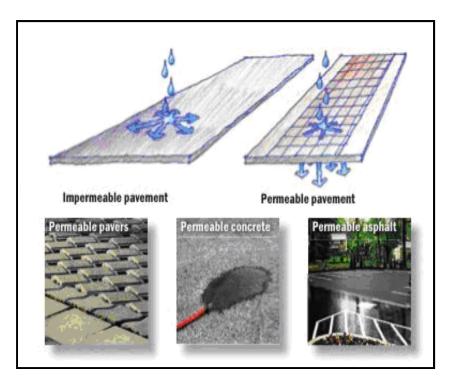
Types of Permeable Pavement (Source: <u>http://www.re-nest.com/uimages/re-nest/06-08-09greenpermeable.jpg</u>)
